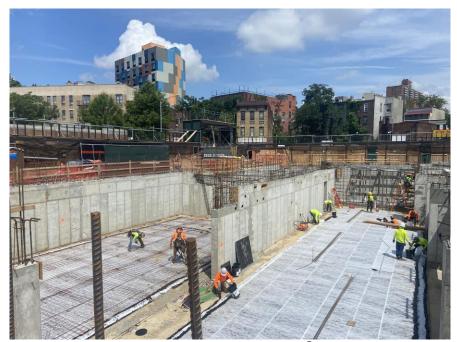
View of Legacy installing W.R. Meadows PRECON® waterproofing atop ¾-inch gravel in the western part of the site (facing northwest).
